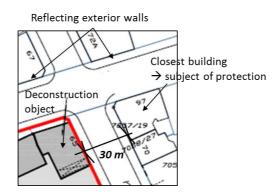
Land-use plan around the deconstruction object (bottom left) with the subject of protection (right) and reflecting exterior walls (top left, top middle, right)
